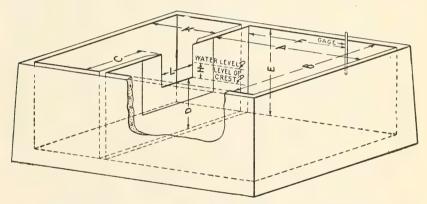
Standard 18-inch weir based on dimensions given in table.
